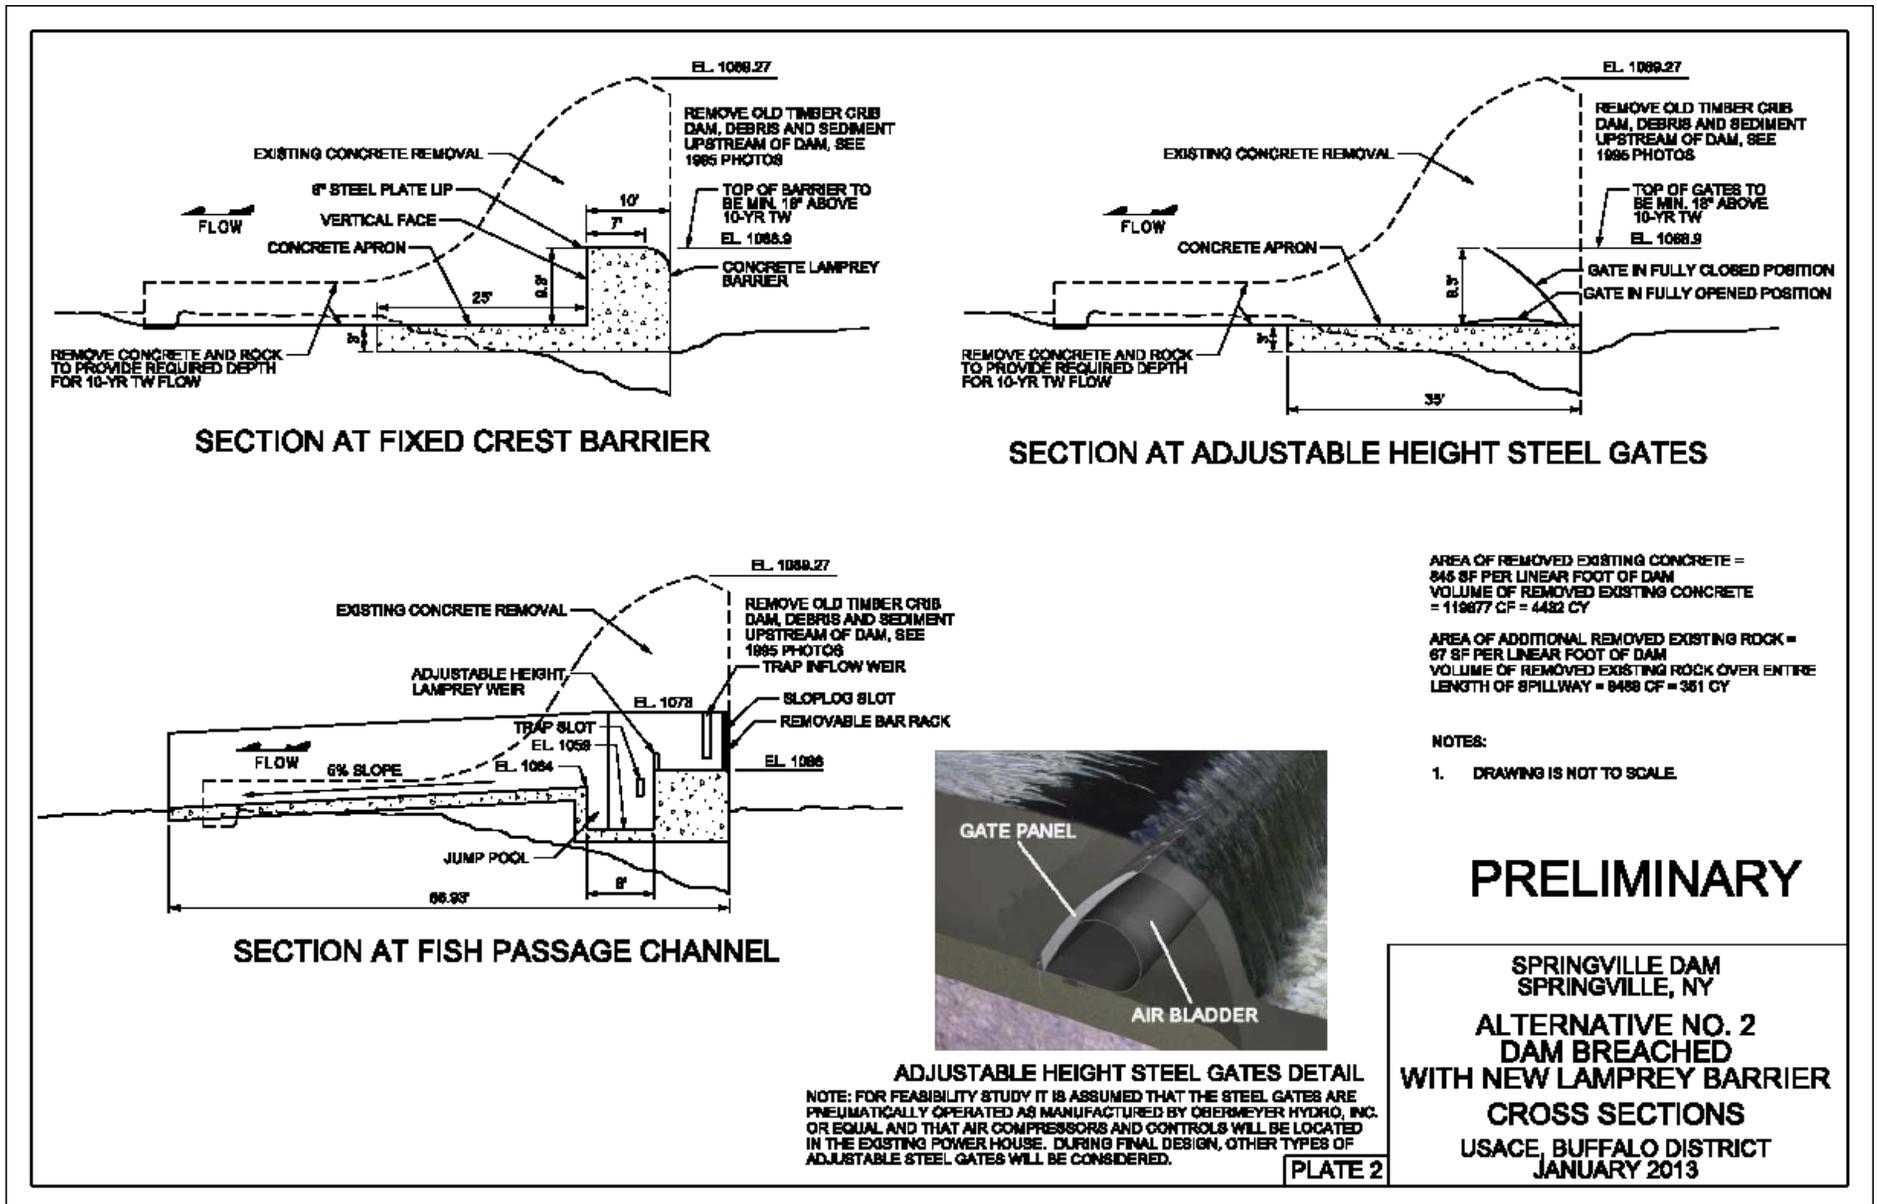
Cross section drawings for Alternative #2 - Dam breach with new lamprey barrier.
